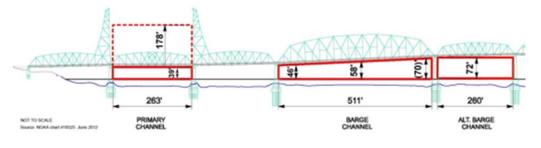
Existing I-5 Bridge Navigation Clearance
